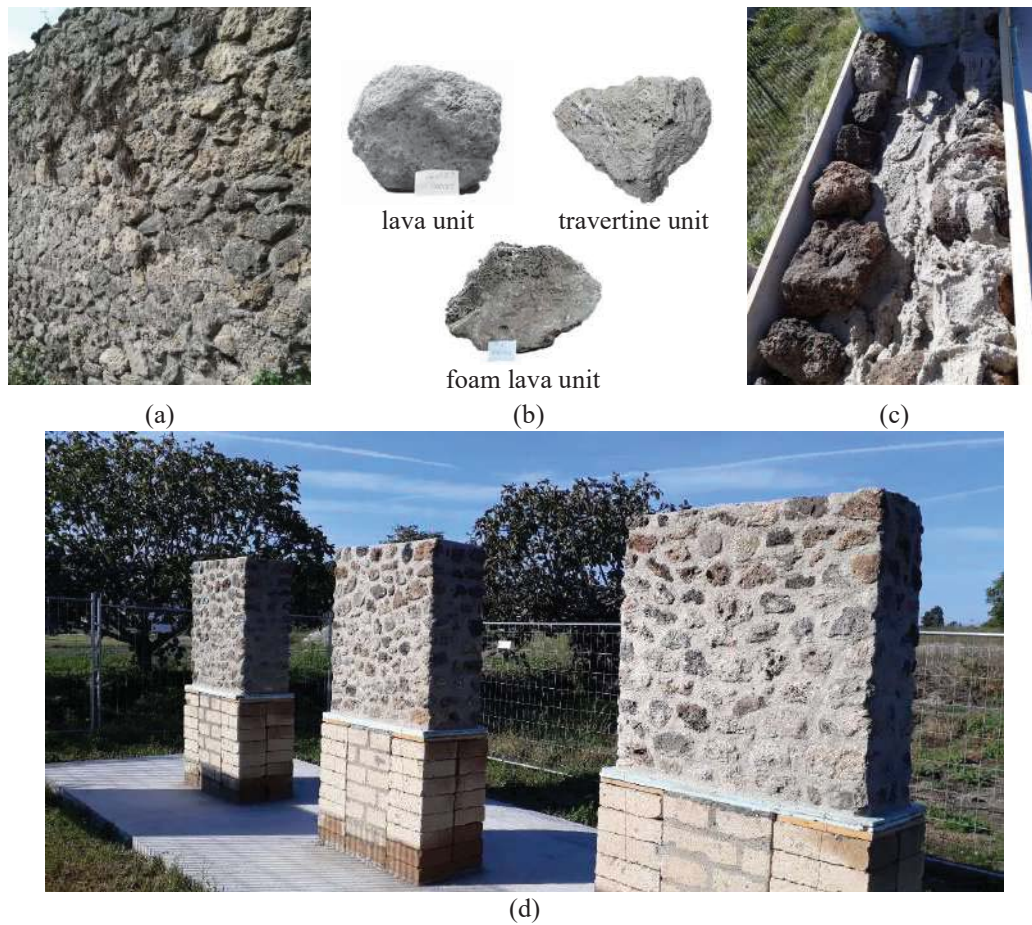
Pompeii-like masonry panels: view of archaeological *opus incertum* masonry structure (a); typologies of the stone units used to make the panels (b); cross-section of a panel during the construction phase (c) and view of the completed panels (from the right S1, S2, and S3) (d).
